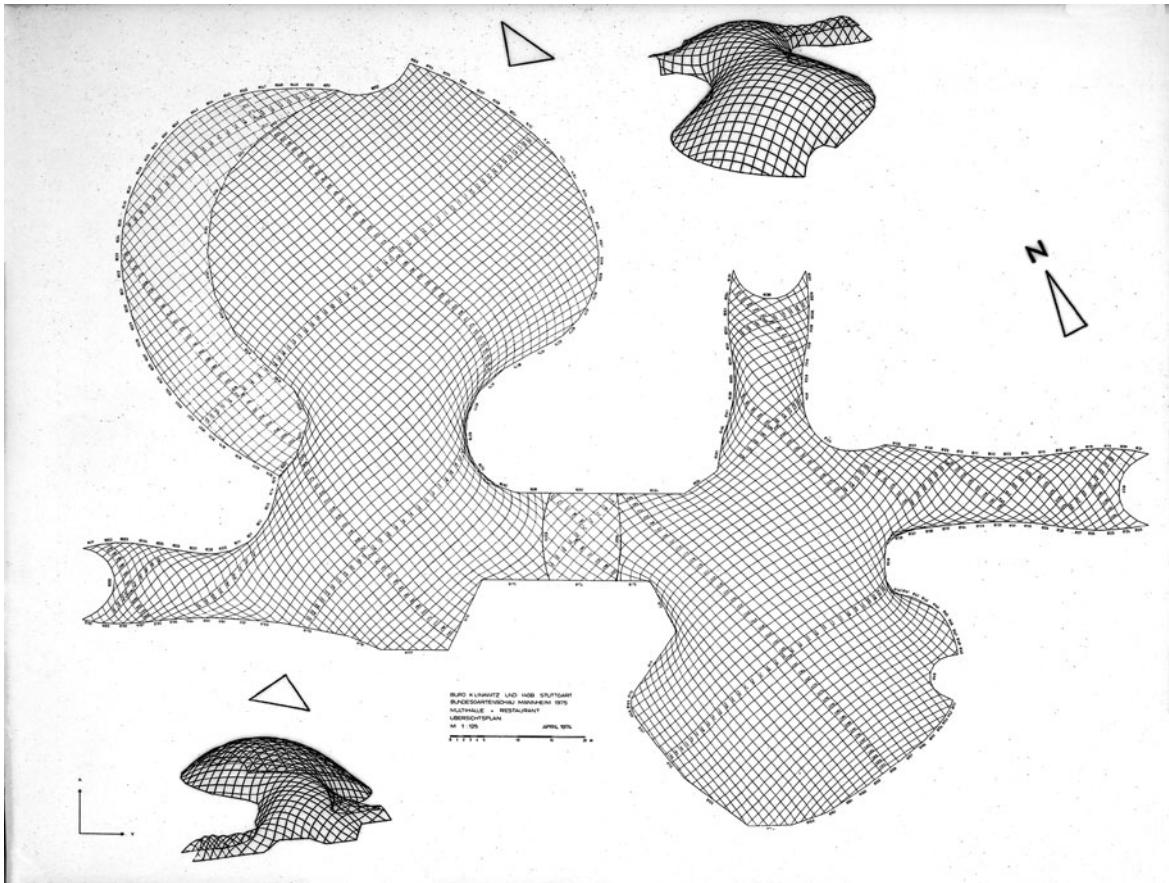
Plan of Multihalle and Restaurant gridshell geometry
